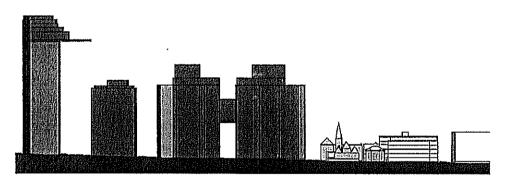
Broadway elevation showing the Proposal (blue) behind a permissible future envelope (light grey) on the corner site owned by the UNDA, and in context with the St Benedicts Church (left) and Frasers/CUB Development (dark grey, far left).
